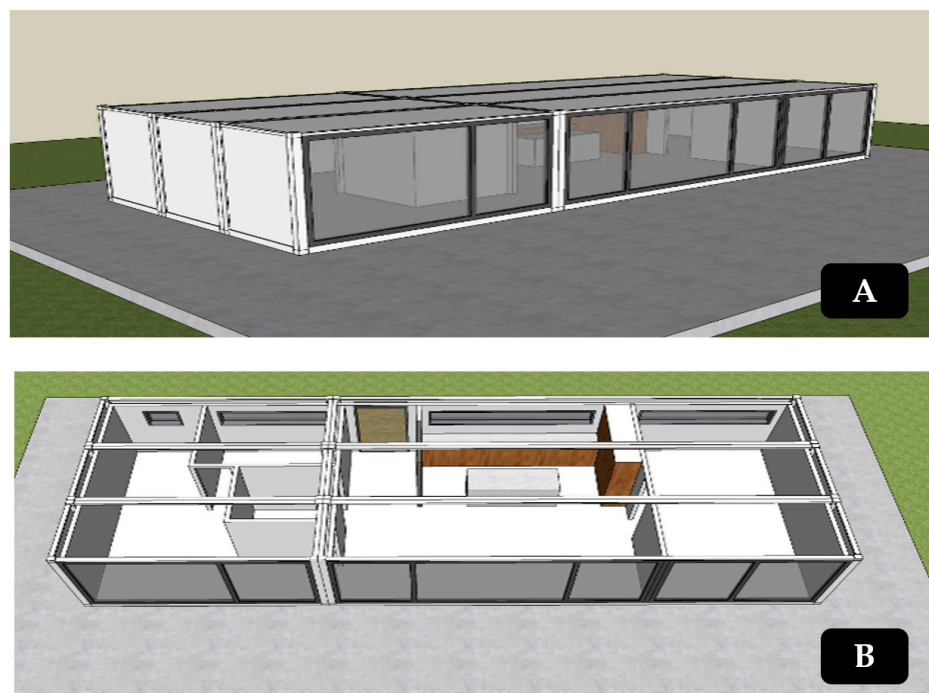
Configuration of the analyzed dwelling. (A): Back façade view. (B): Plan view of the interior layout.
